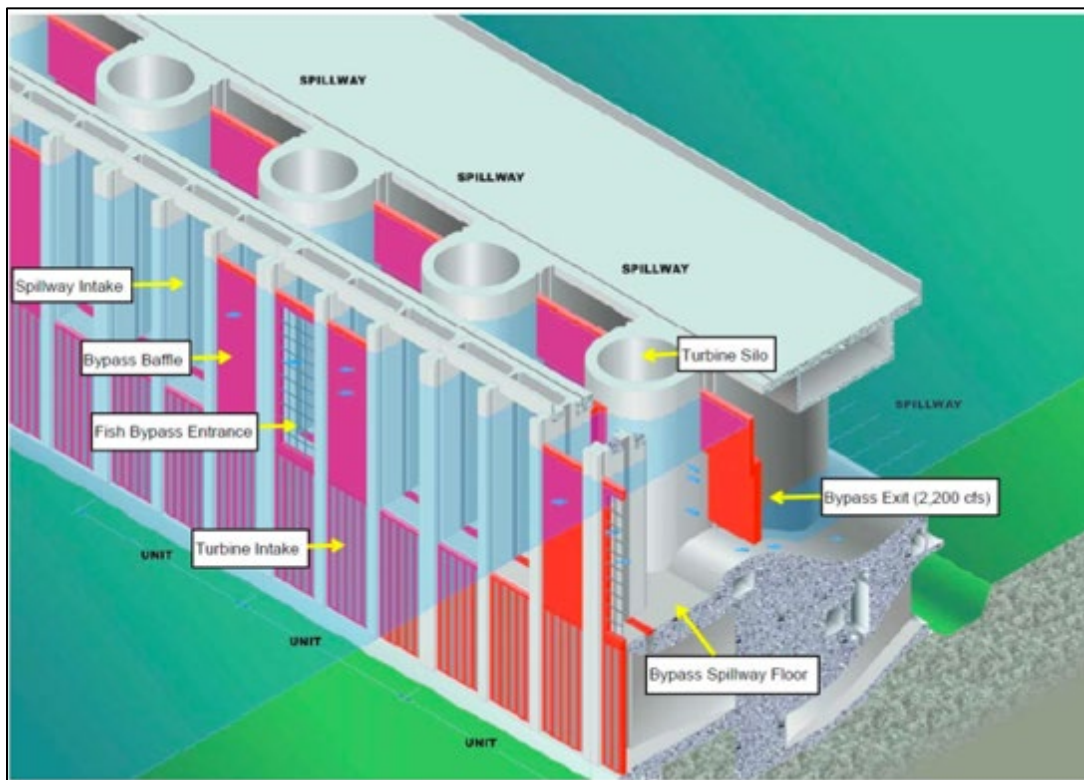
Artistic depiction of Wells Dam illustrating its hydrocombine design and Juvenile Bypass System (Source: LIH application)
